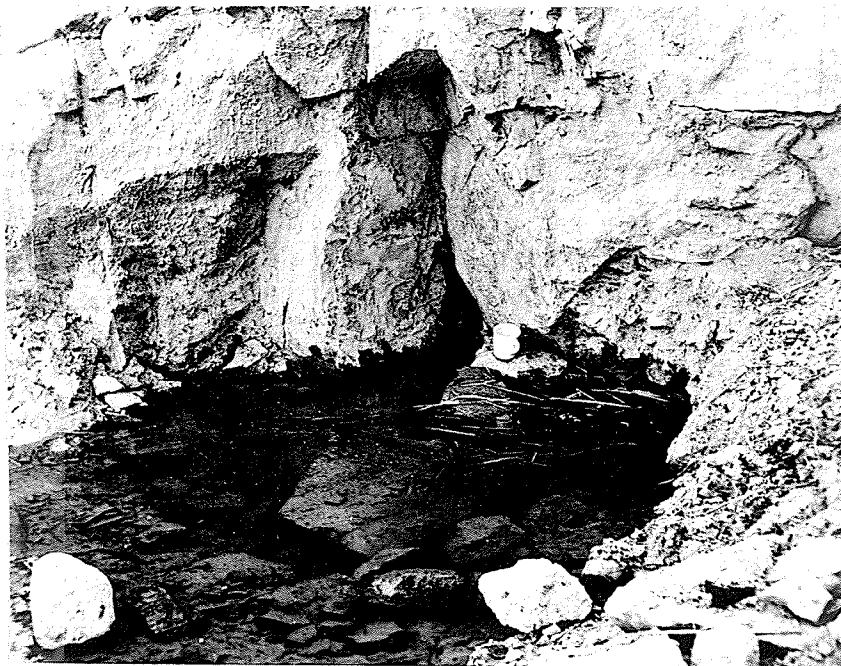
Exposed surface of Precambrian bedrock at the WNRE plant site excavation.
